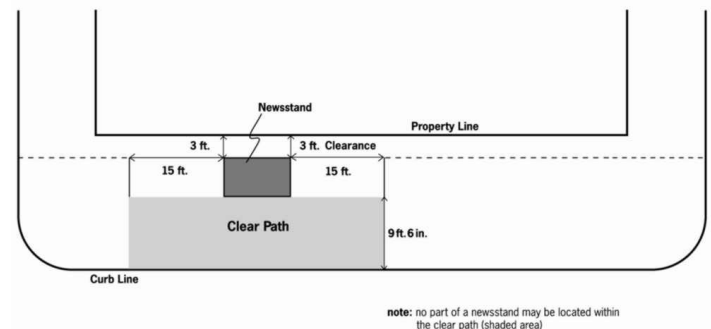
Typical full block front plan showing clearance from corners and curb of streets.
